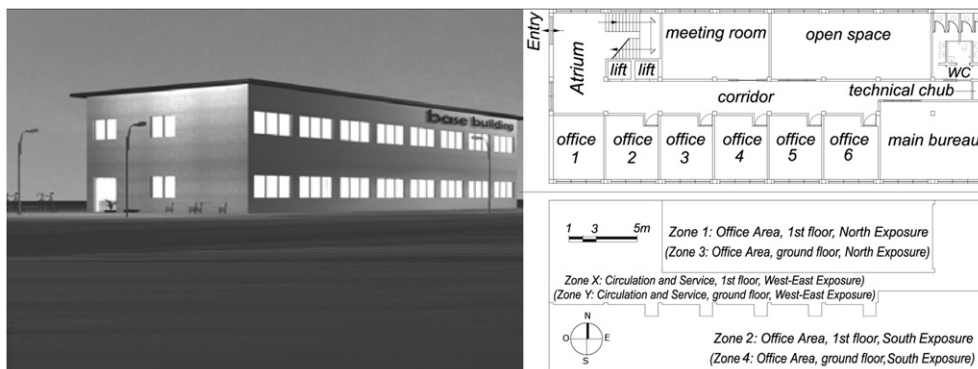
The modelled building: volumetric scheme, plan of the ground floor and thermal zones.
